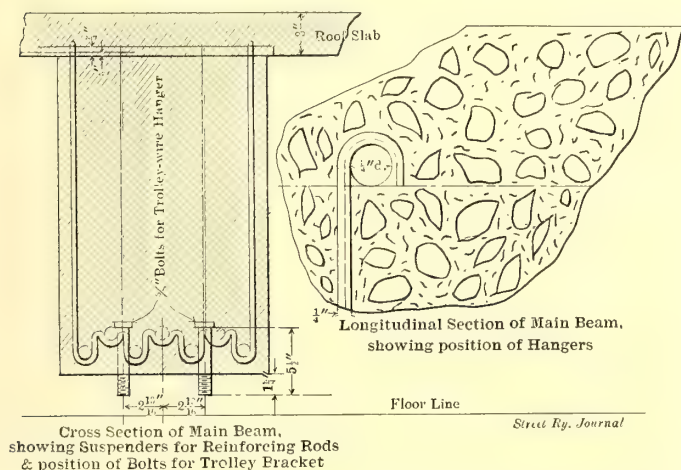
SOME DETAIL WORK IN THE CENTRAL PENNSYLVANIA TRACTION COMPANY'S NEW CAR HOUSES
